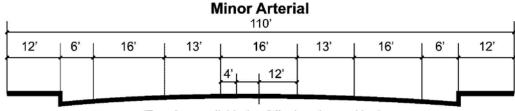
CITY OF RANCHO MIRAGE GENERAL PLAN ROADWAY CROSS-SECTIONS
